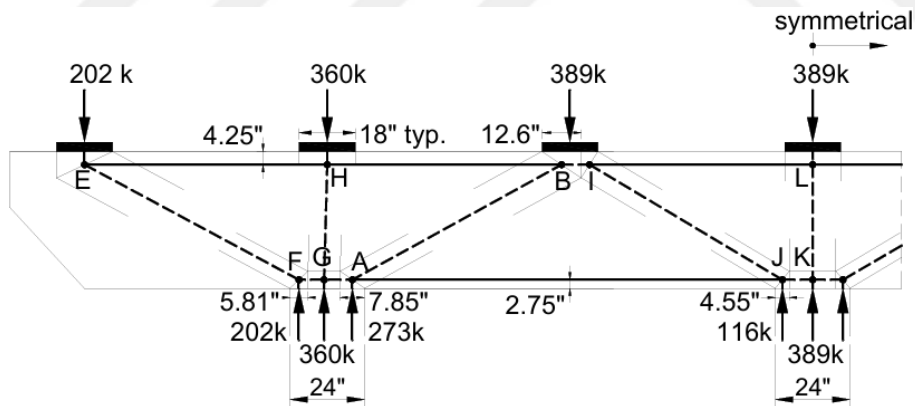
The proposed Strut-and-Tie Model of Pier Cap 5 (Mitchell and Collins, 2013)
